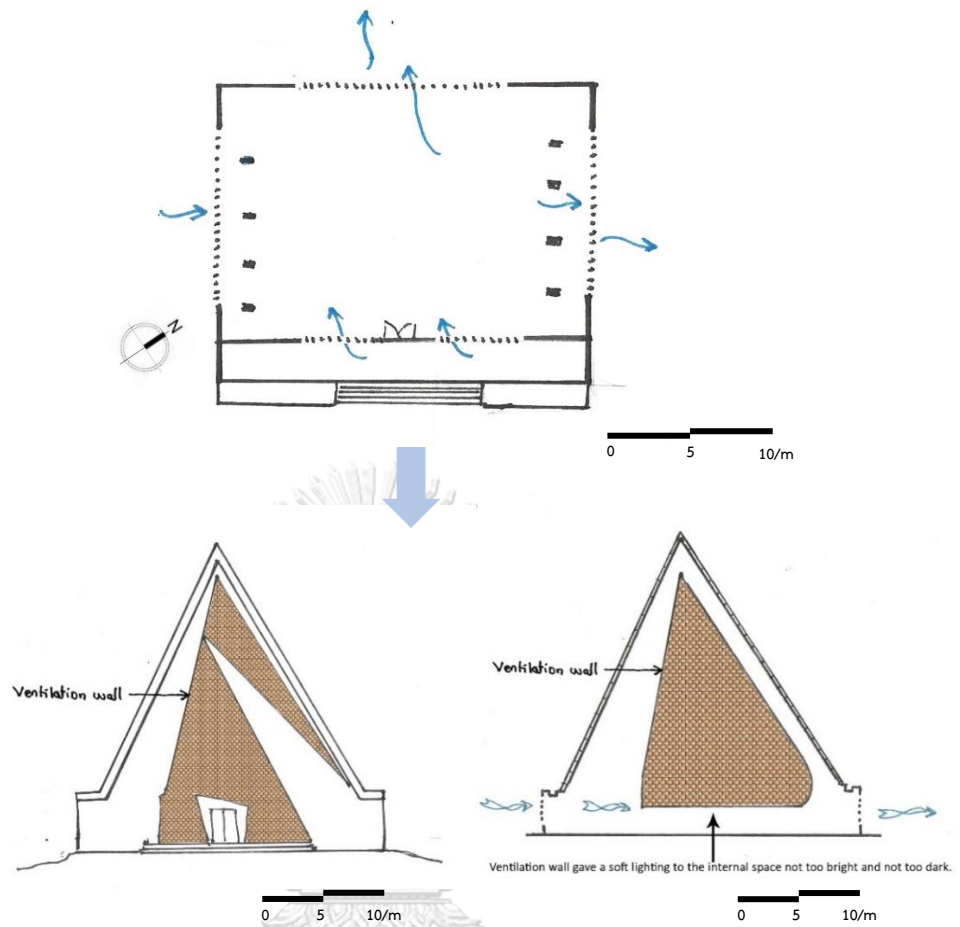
15 Drawing of the layout with the front and back elevation of the building design with a prefabricated ventilation block
